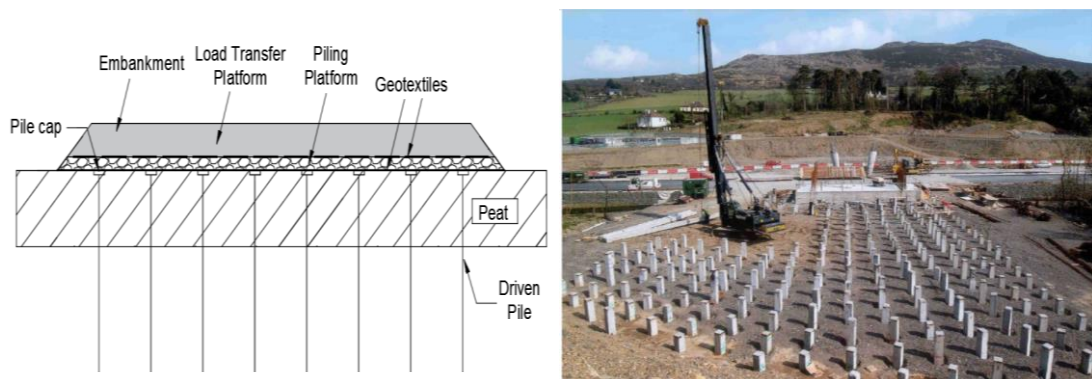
(a) Typical section for piled embankment and (b) pile installation for a piled embankment (Orsmond, 2012)
